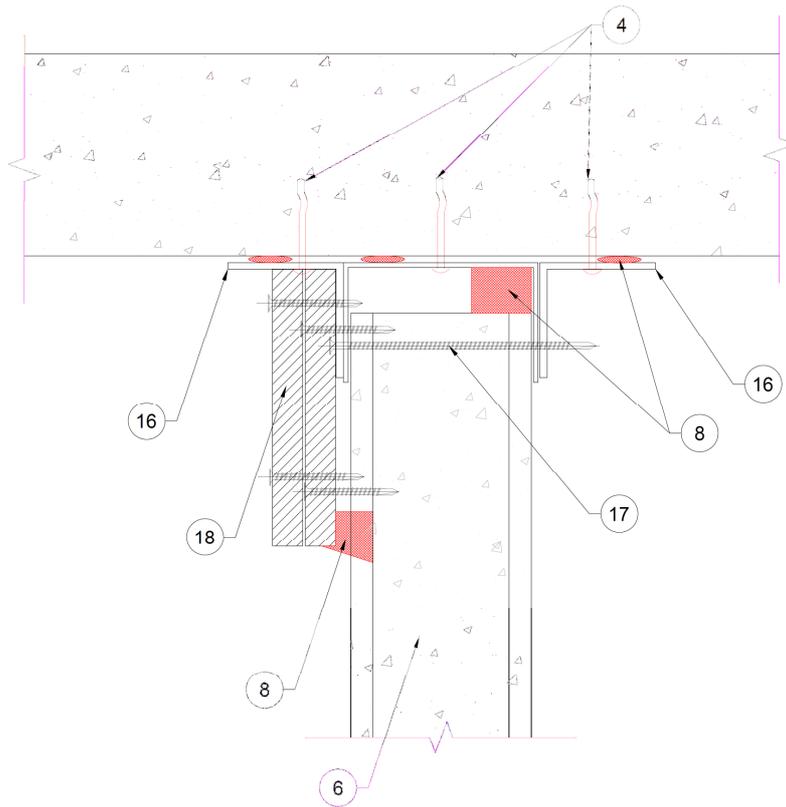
Head Detail for Suspended Vertical Speedpanel Wall
